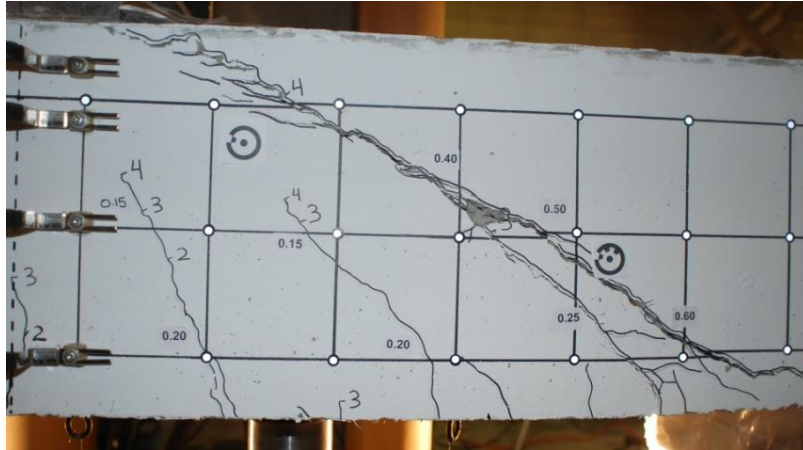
Overall Failure Crack on South Face of S300-A2
